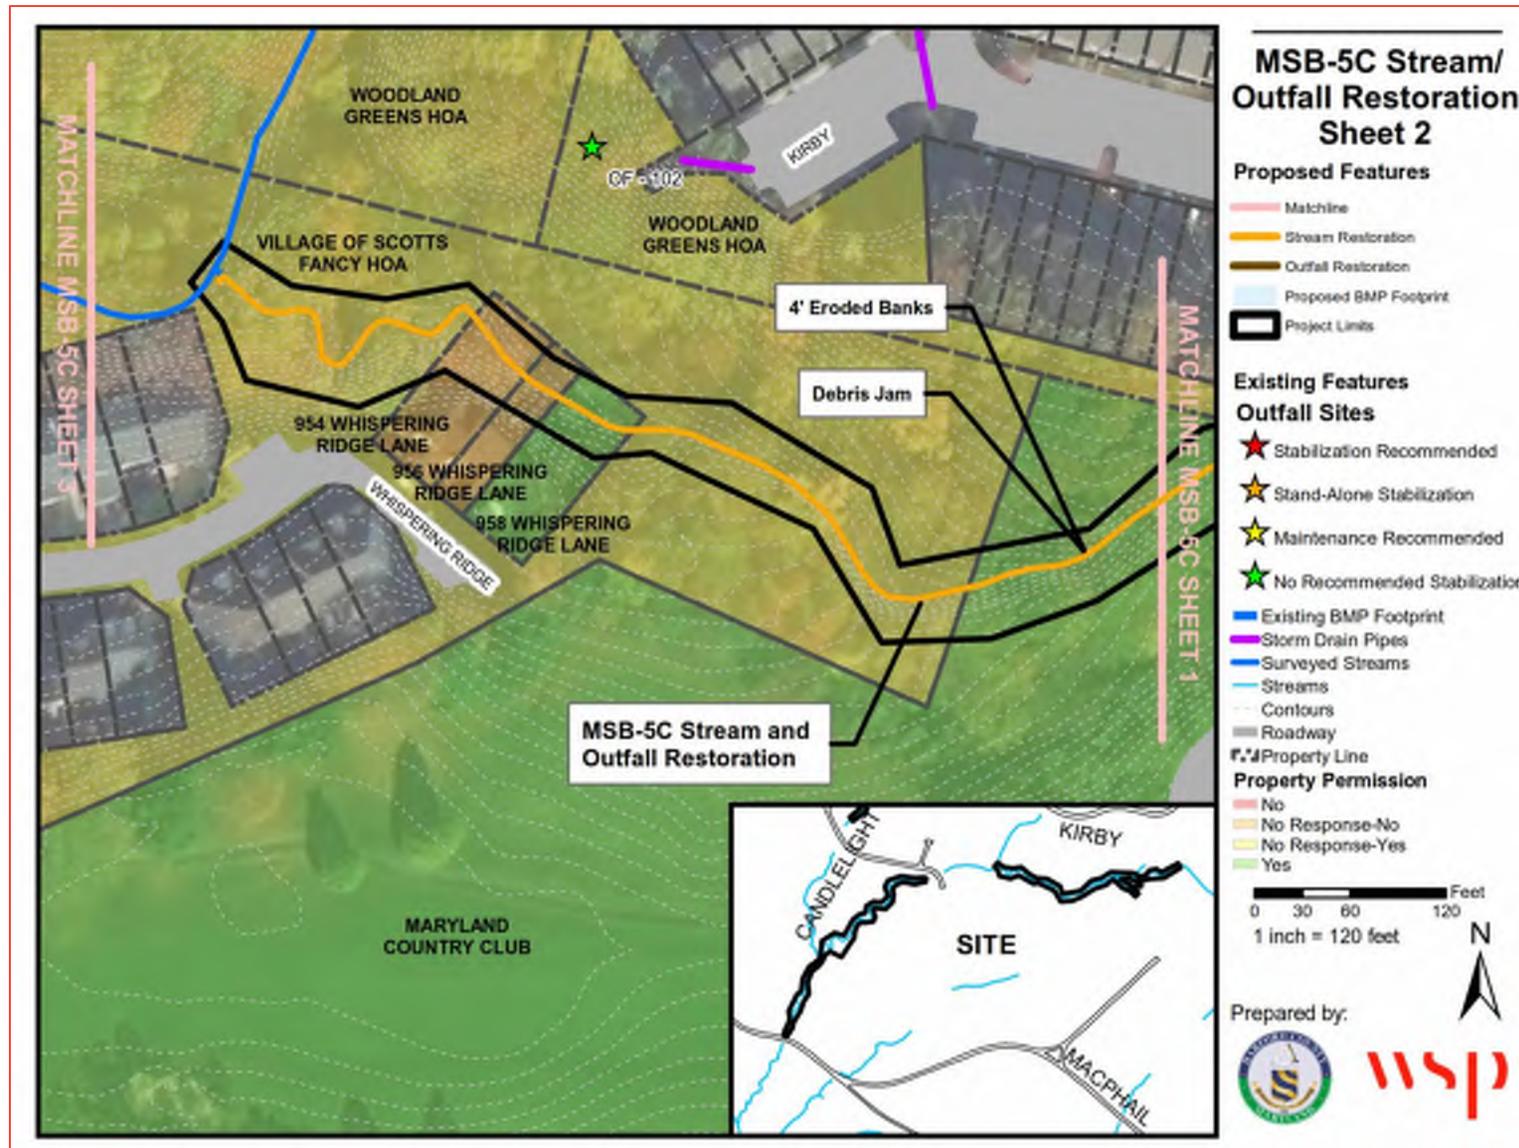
Site Location and Proposed Project Plan for GrMSB-5C Stream and Outfall Restoration (Sheet 2 of 5)
